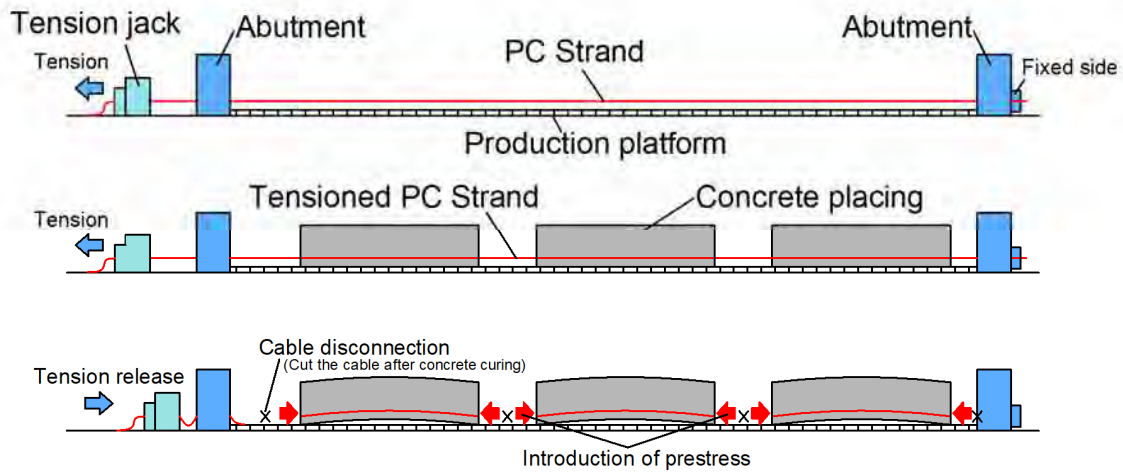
Pretensioned Girder Fabrication Method Using Large Jacks
